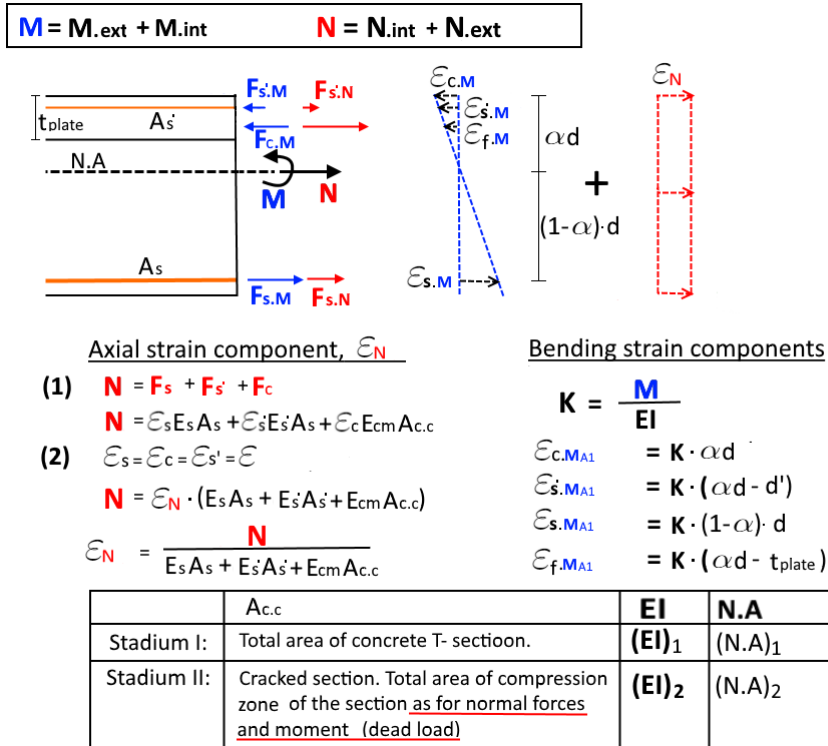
Step 3: Finding internal forces in reinforcement and concrete
